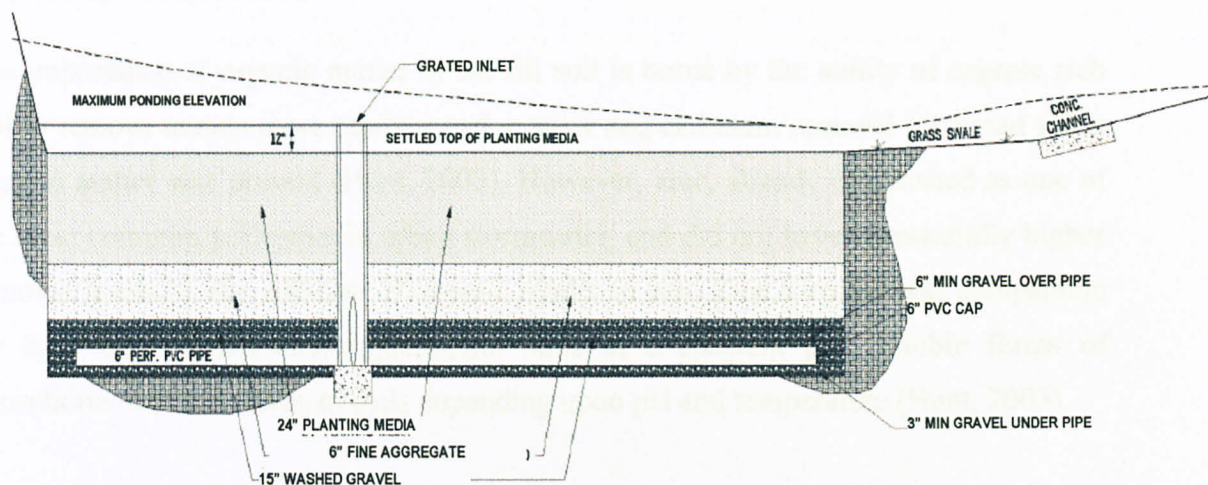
Typical cross-section of biofiltration (parallel to under drain)
